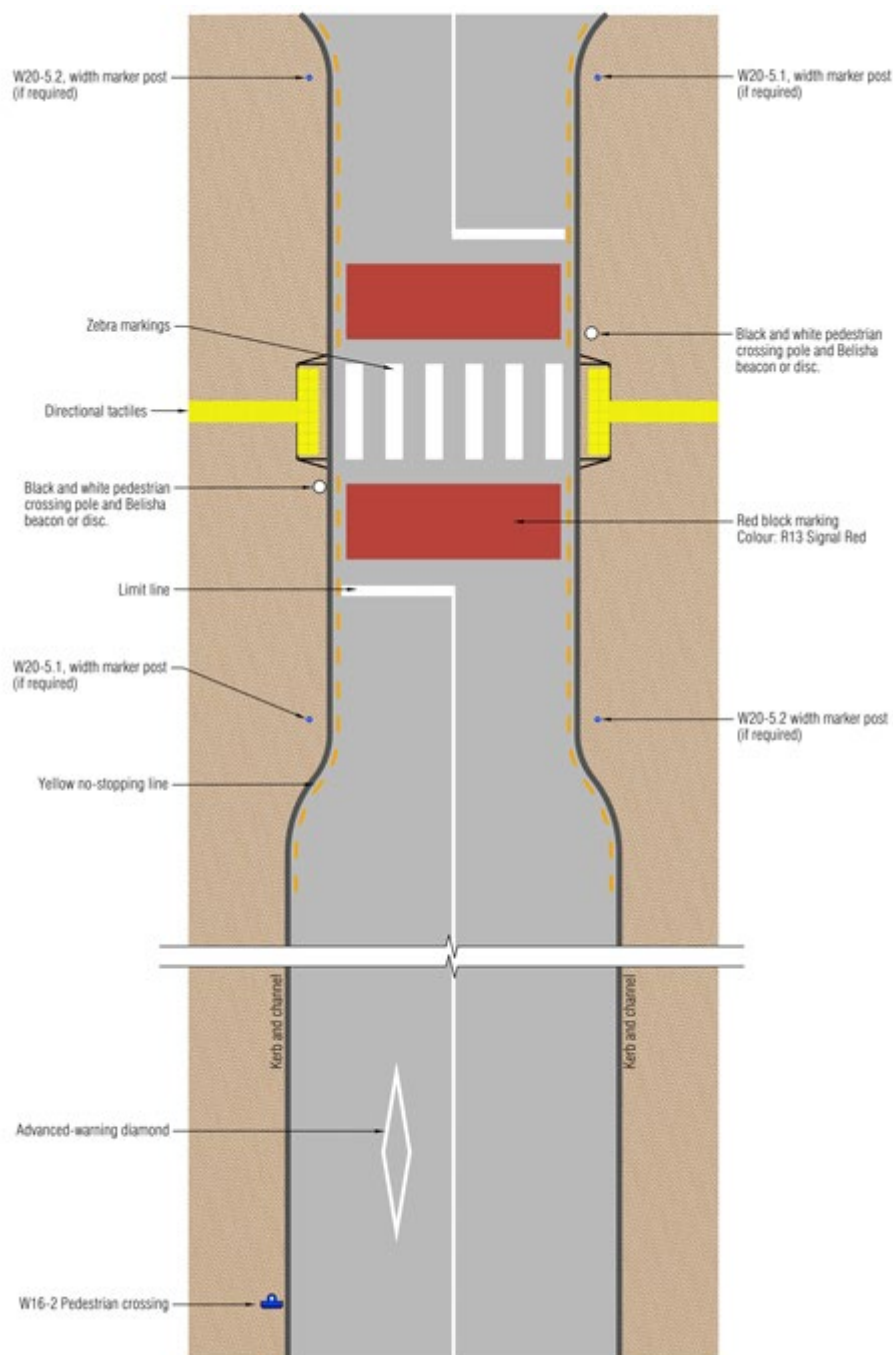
Typical layout for zebra crossing with red surfacing treatment
